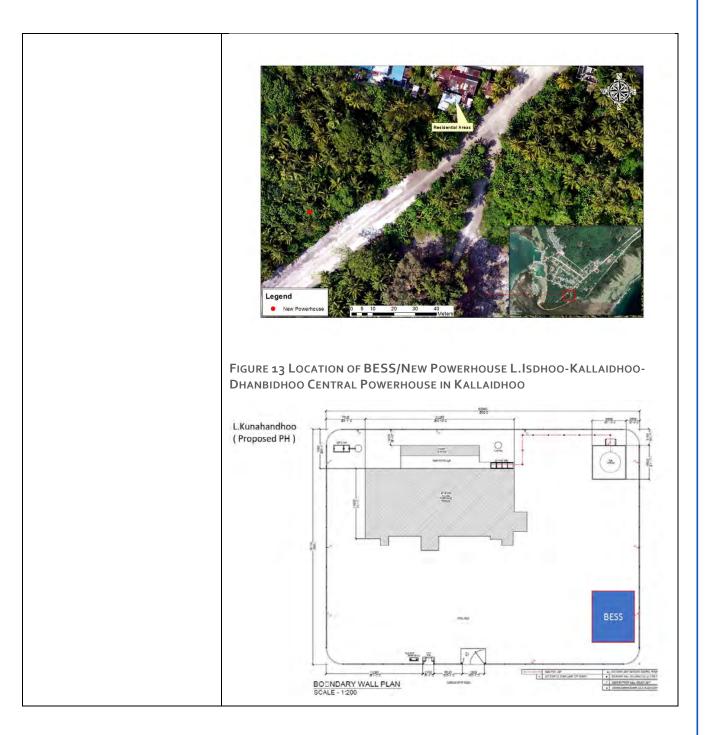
LOCATION OF BESS/NEW POWERHOUSE L.KUNAHANDHOO
